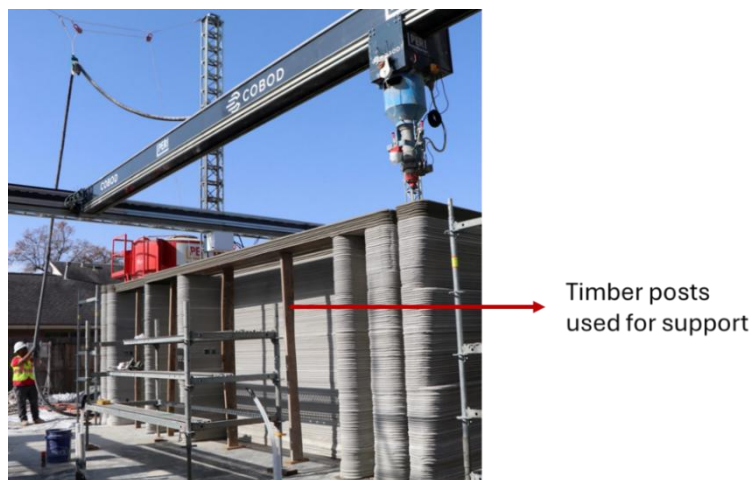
Example of Scaffold-Formwork Utilization in 3DCP Construction (URL-7).
